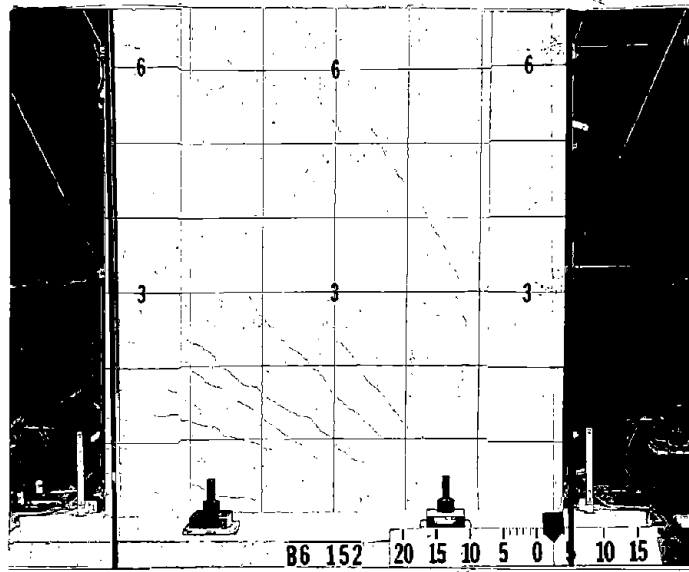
Cracking Pattern at +3 in. Deflection for Specimen B6
